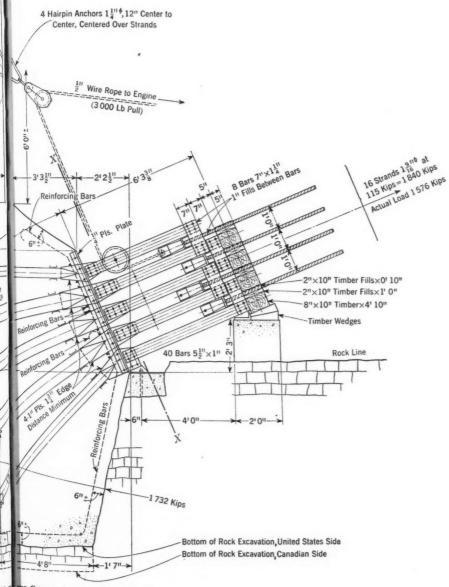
ELEVATION OF ANCHORAGE OF THE CENTER
